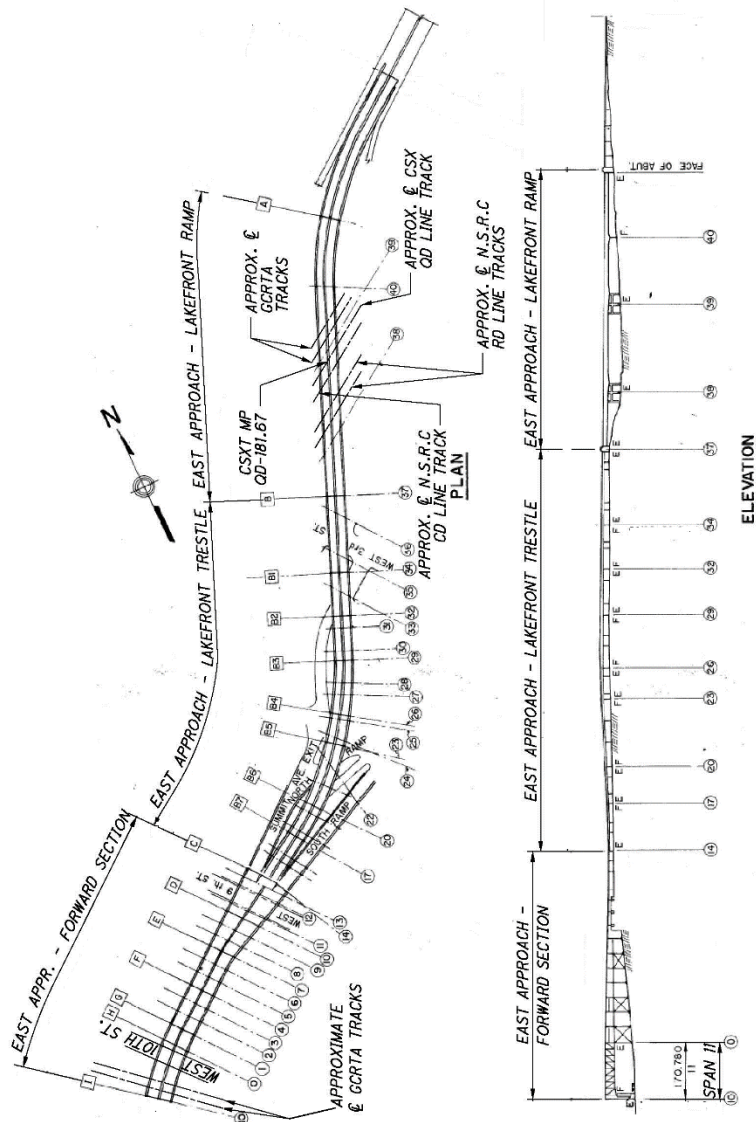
Units III, IV & V - Bridge Plan and Elevation V
